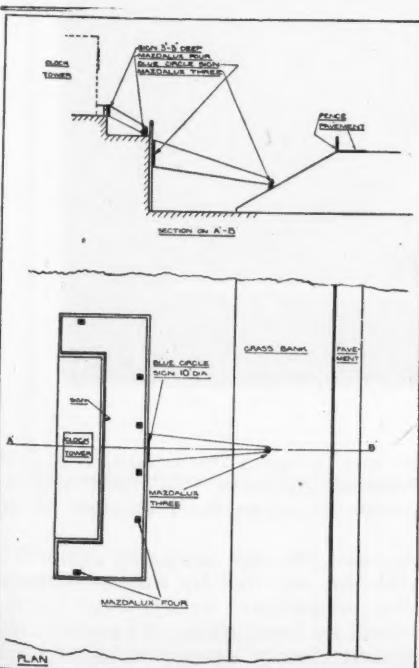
Plan and Sectional View showing position of floodlighting equipment.
